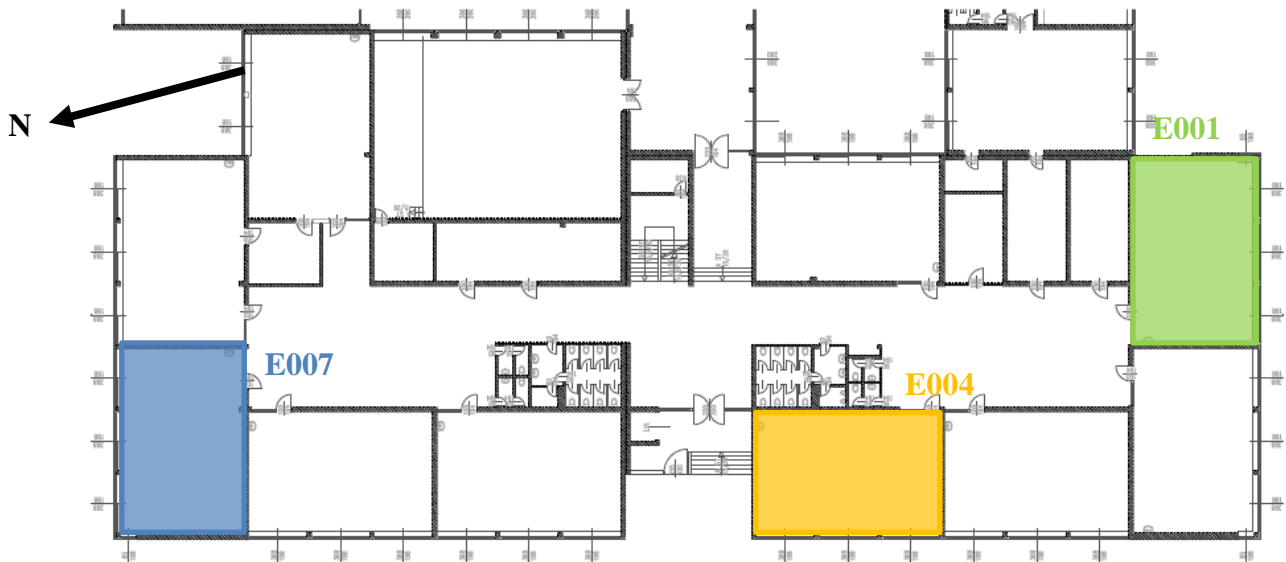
Ground plan of the existing school building with the three investigated rooms (marks) (Source: LIG)
